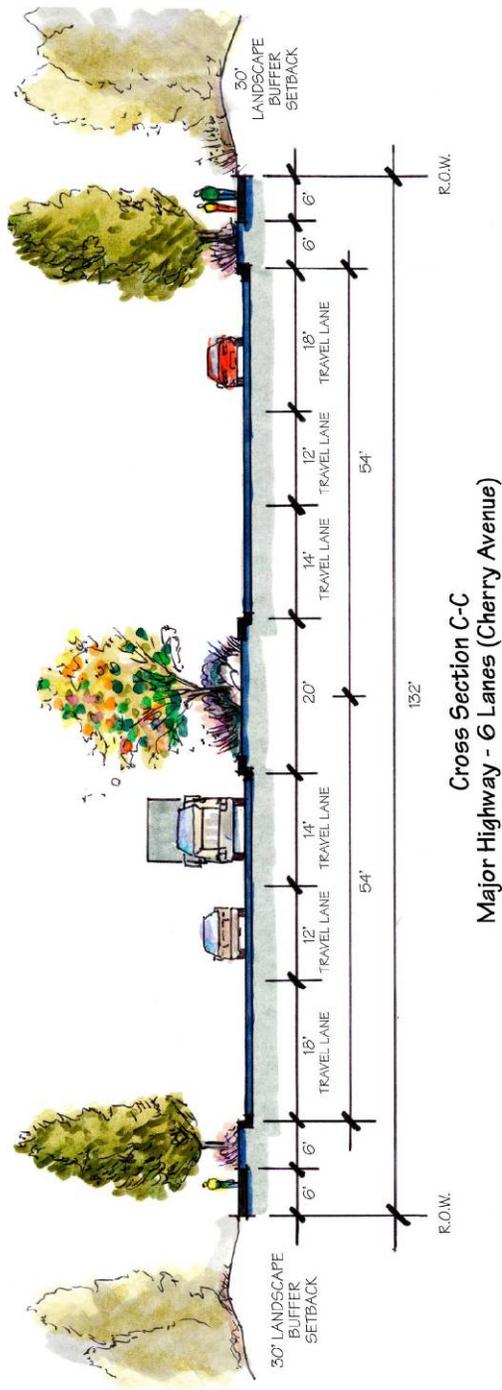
Major Highway – 6 Lanes – Cross-Section C-C (Cherry Avenue)
